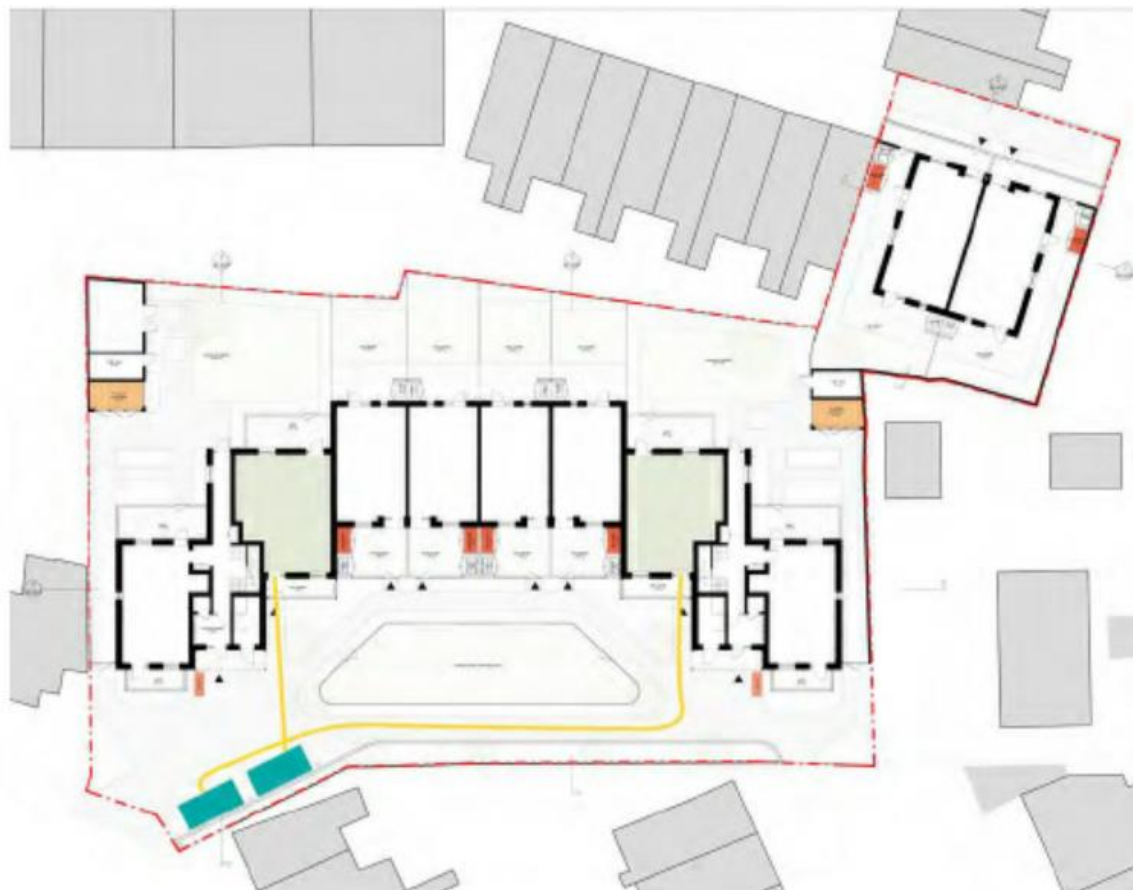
Proposed highway arrangement: pedestrianised zone except vehicular access to front (left side of figure) and two blue badge parking bays
